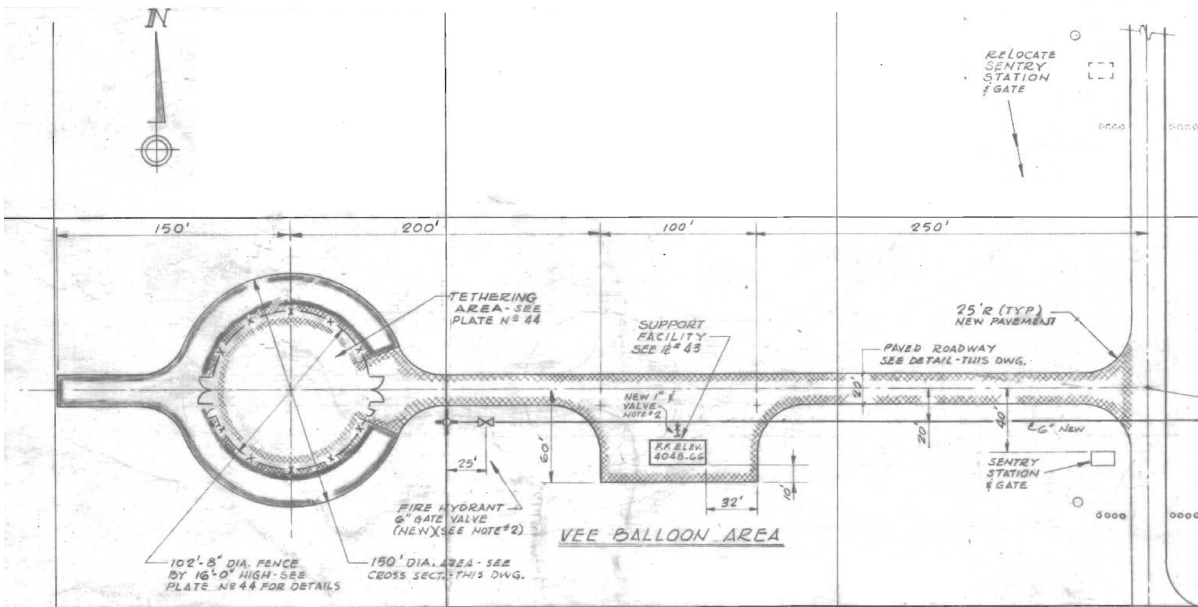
Layout plan of VEE Balloon Inflation Area from 1963 WS-KR plans.
